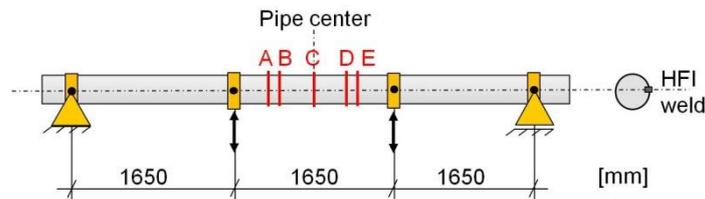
Test pipe installation and instrumentation with measurement planes A to E
